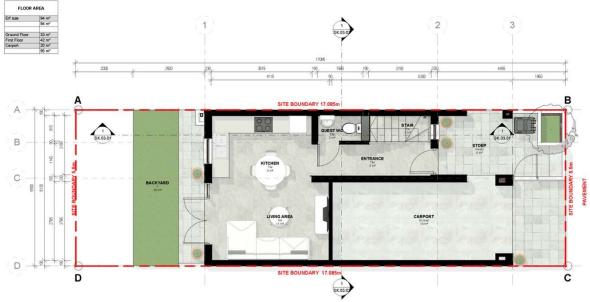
Unit Type 1 Ground Floor Plan
